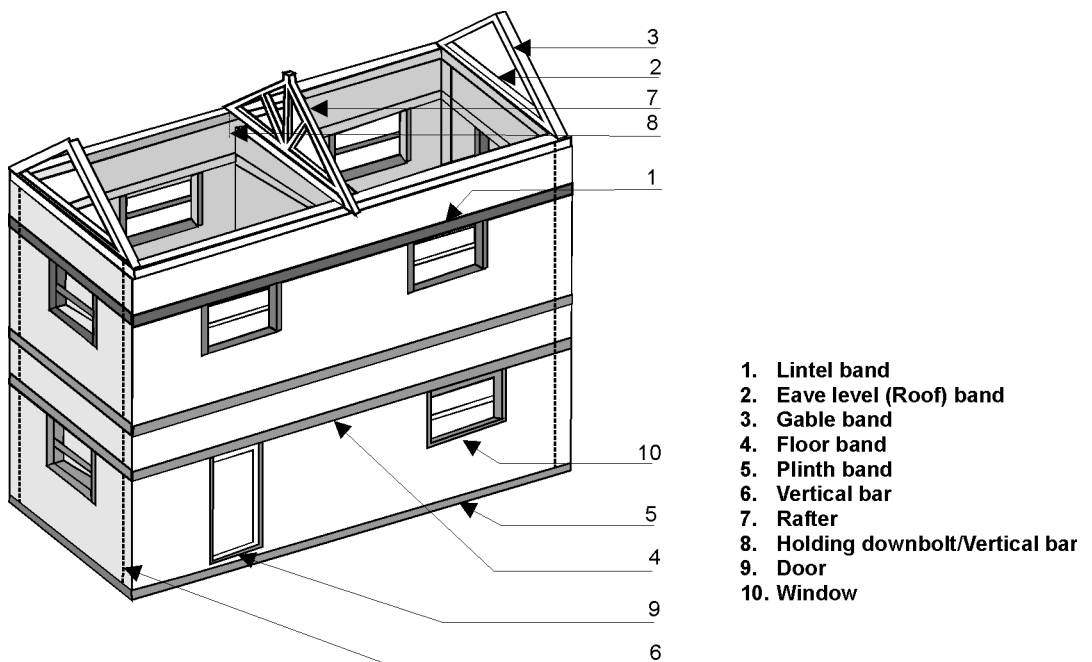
B Overall arrangement of reinforcing in masonry double storey building having pitched roofs
